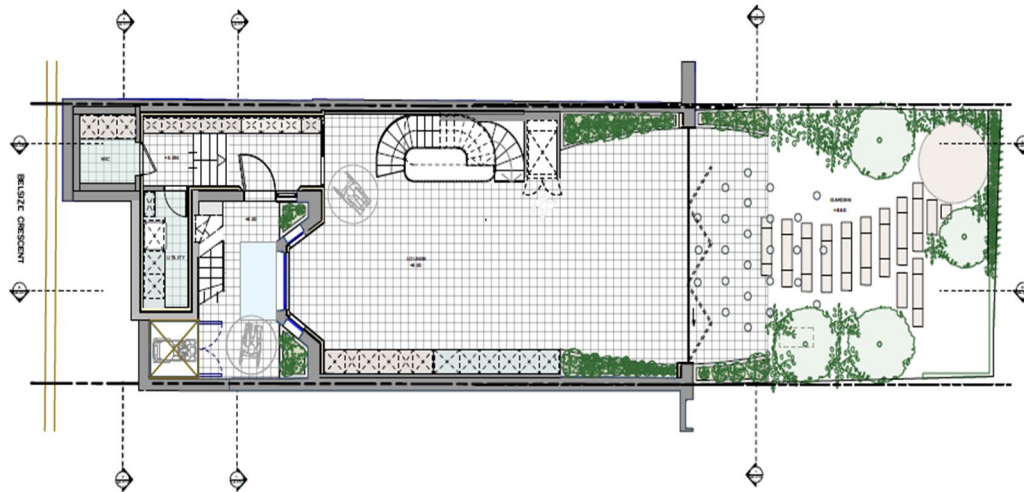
Proposed Lower Ground Floor Garden Plan: drawing number GA 307 (Undercover Architecture)
